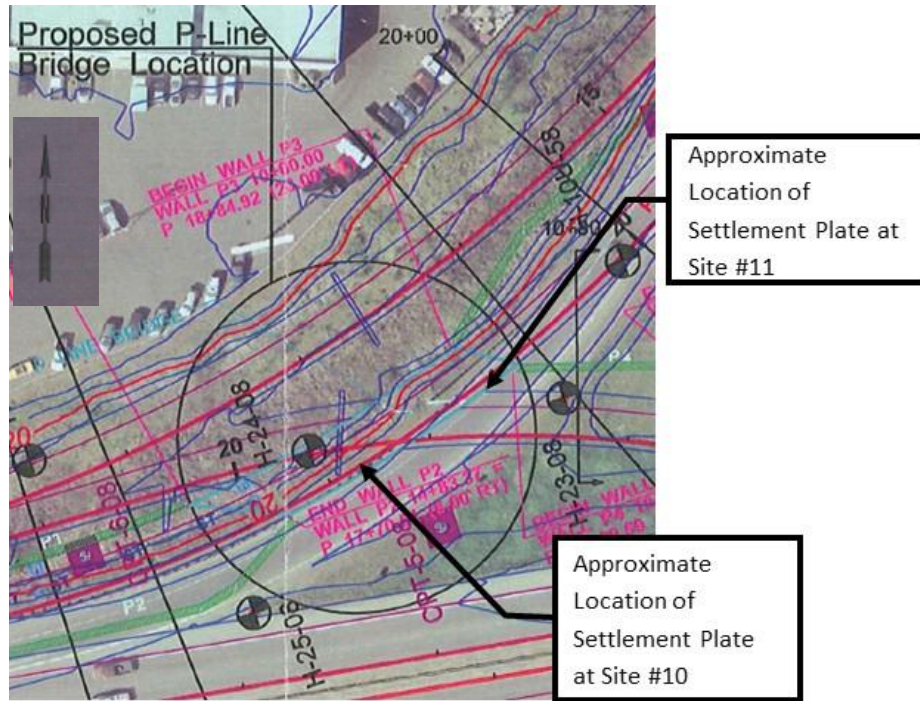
Plan View of Sites No.10 and No.11, the P-Line Bridge Pre-Load Area with Boring Locations.
